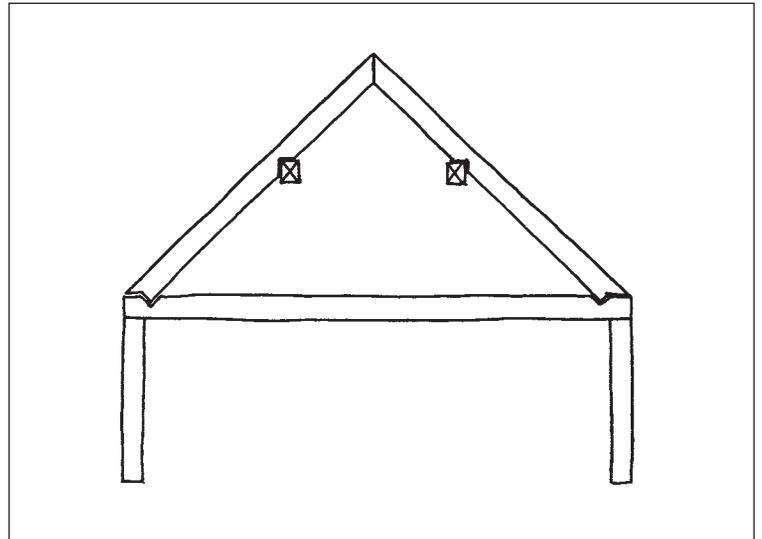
Purlin-supported rafters produce little thrust at plate.
